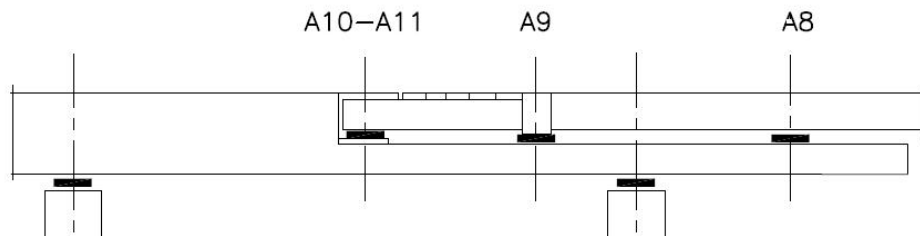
Bearing layout at terminal structure on Sicilia side - side view
